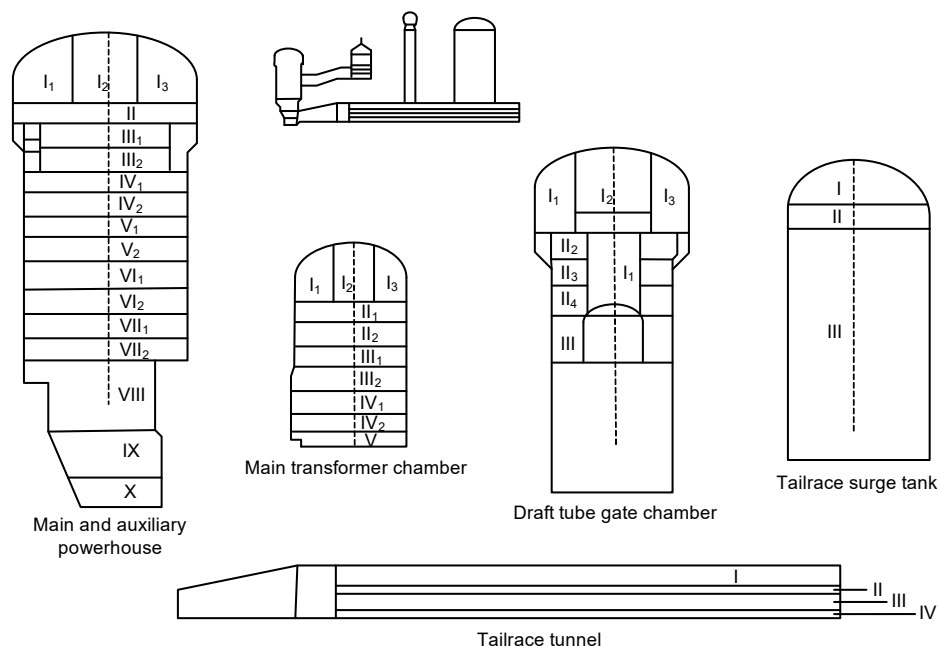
Schematic diagram of the excavation and stratification of the Baihetan underground cavern group
